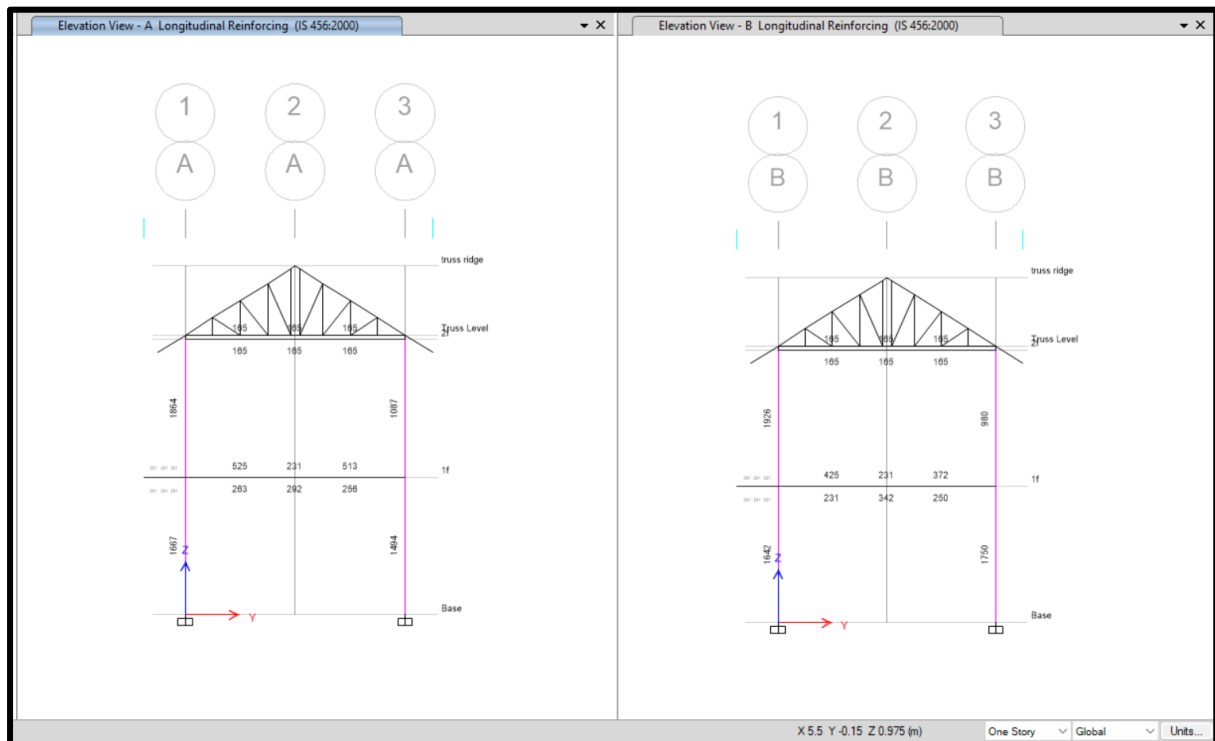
Typical longitudinal reinforcement of column in grid A and B
